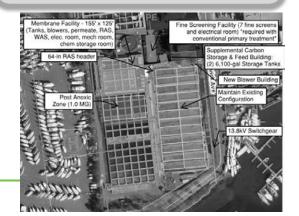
ZeeLung installation concept at Bridgeport WWTP West Plant
